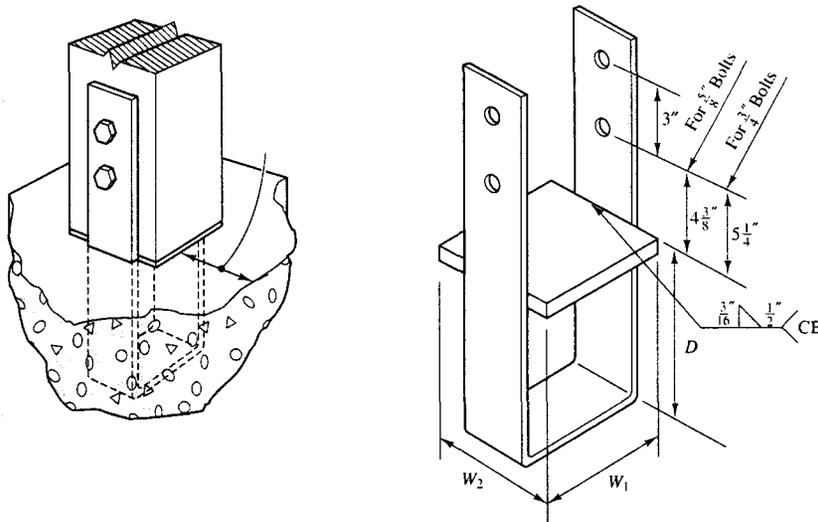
Steel post base for securing a wood post to a spread footing (Simpson Strong-Tie Co., Inc.).
